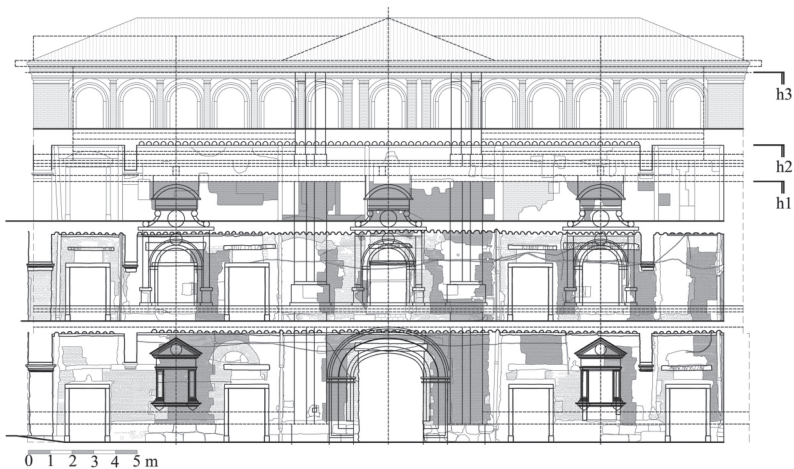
North wall of the Patio. The main façade of the building has been superimposed. It can be observed the coincidence of some of the present voids of the Patio with the windows of the façade. h1: original height: 43 feet (1508); h2: cloister height: 49 feet (1670); h3: façade height: 61 feet (1553).
